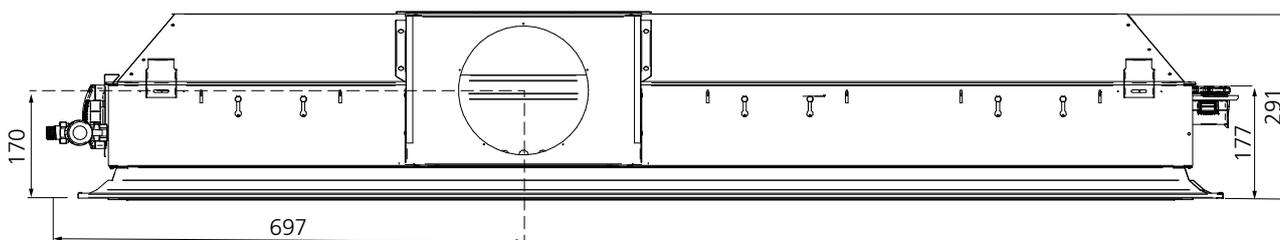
Dimensional drawing, side view. Air connection on the long side - pos 2.
